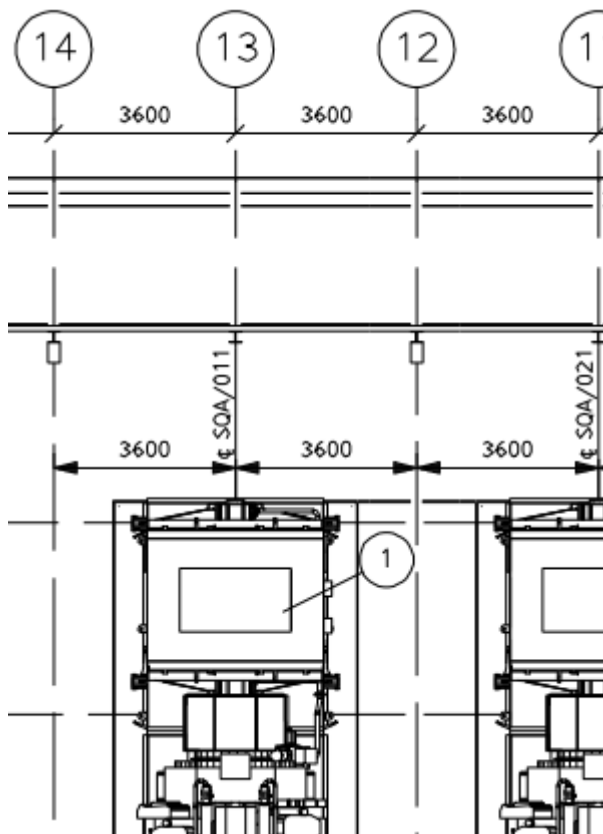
Typical dimensions of generator set section with W46/W50 engines.
